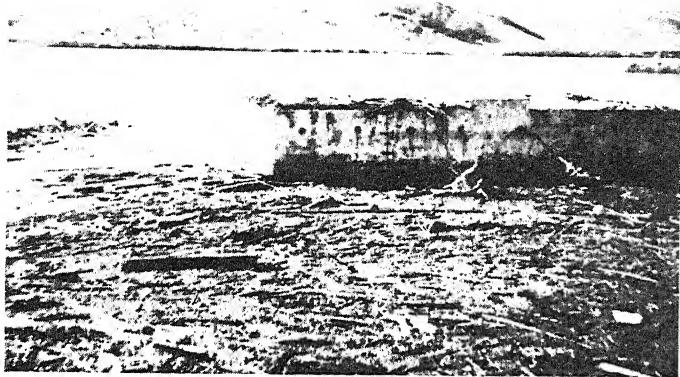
1/27/69 10:32 a.m. Spillway at -02.
